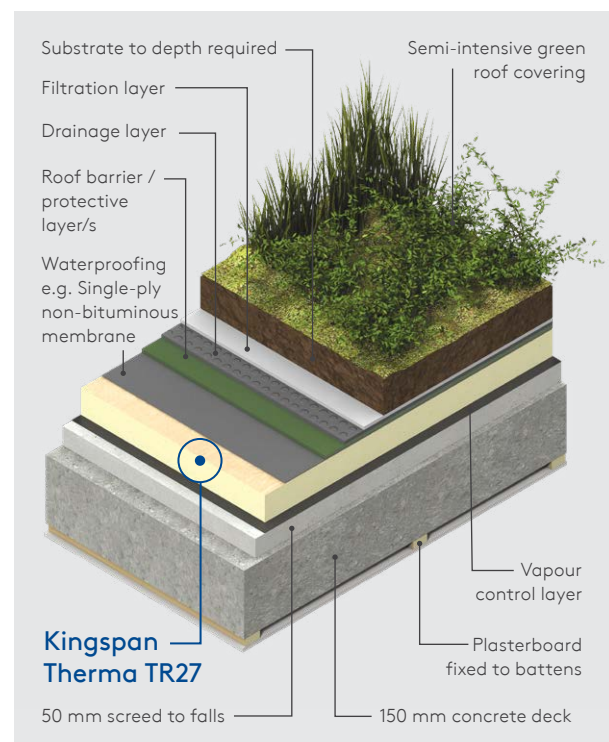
Semi-Intensive Green Roof Covering – Dense Concrete Deck with Suspended Ceiling
